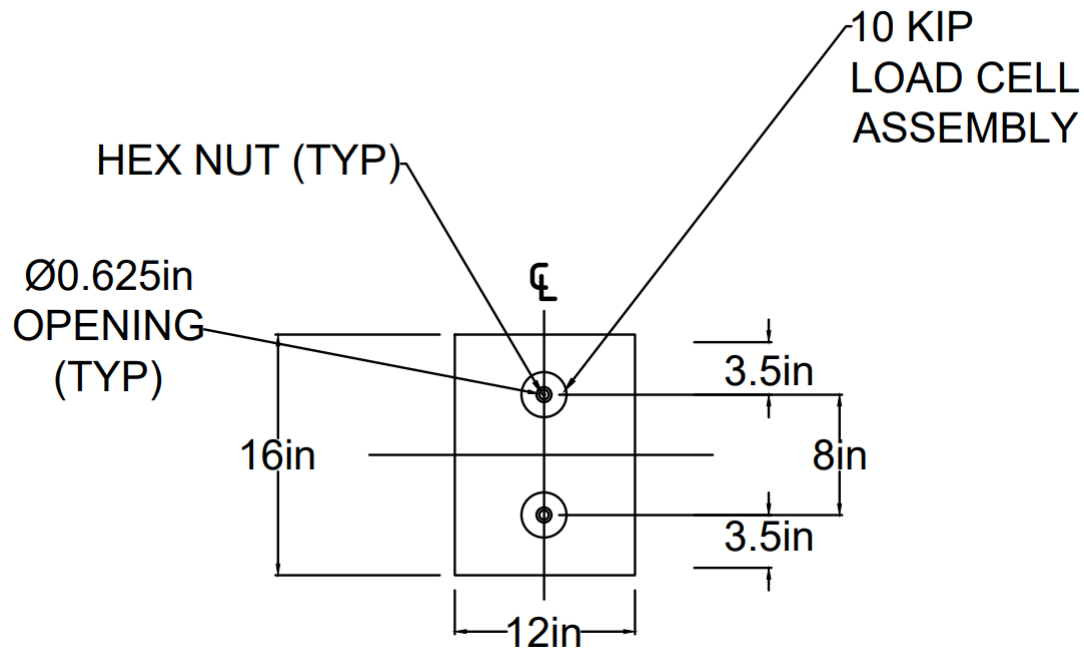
Plan view of small-scale MPP specimens (credit: E. Baas)
